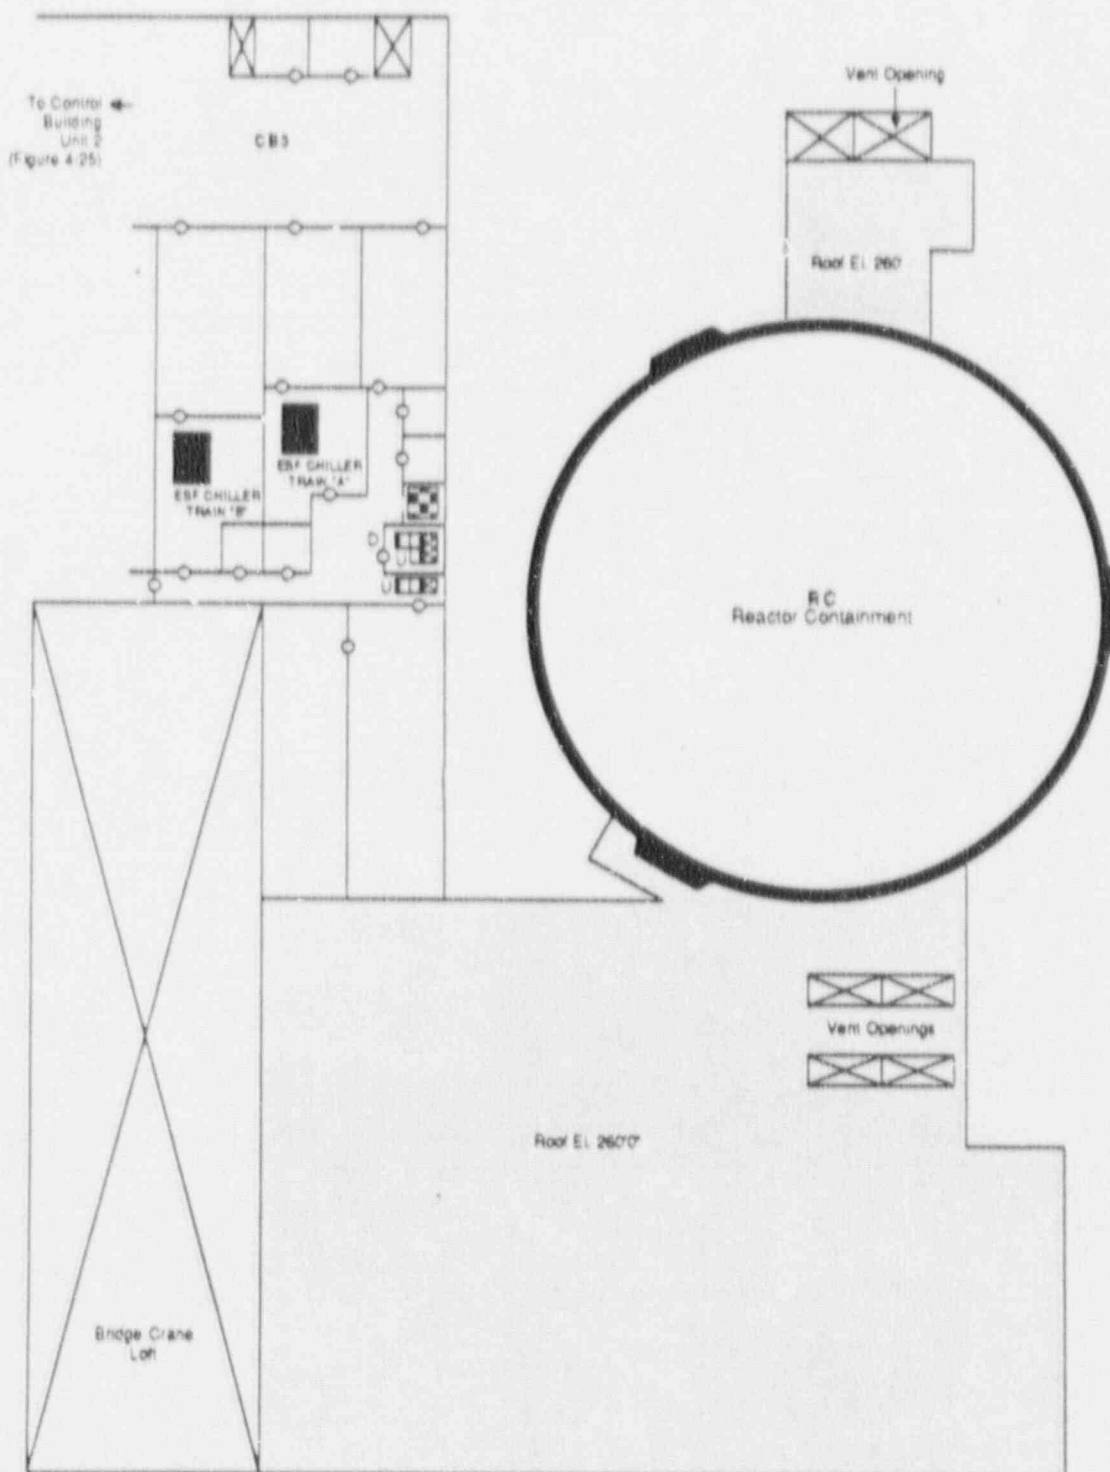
Vogtle 1 Reactor Containment, Control Building, and Fuel Handling Building, Level 3 (Elevation 260.0'')
